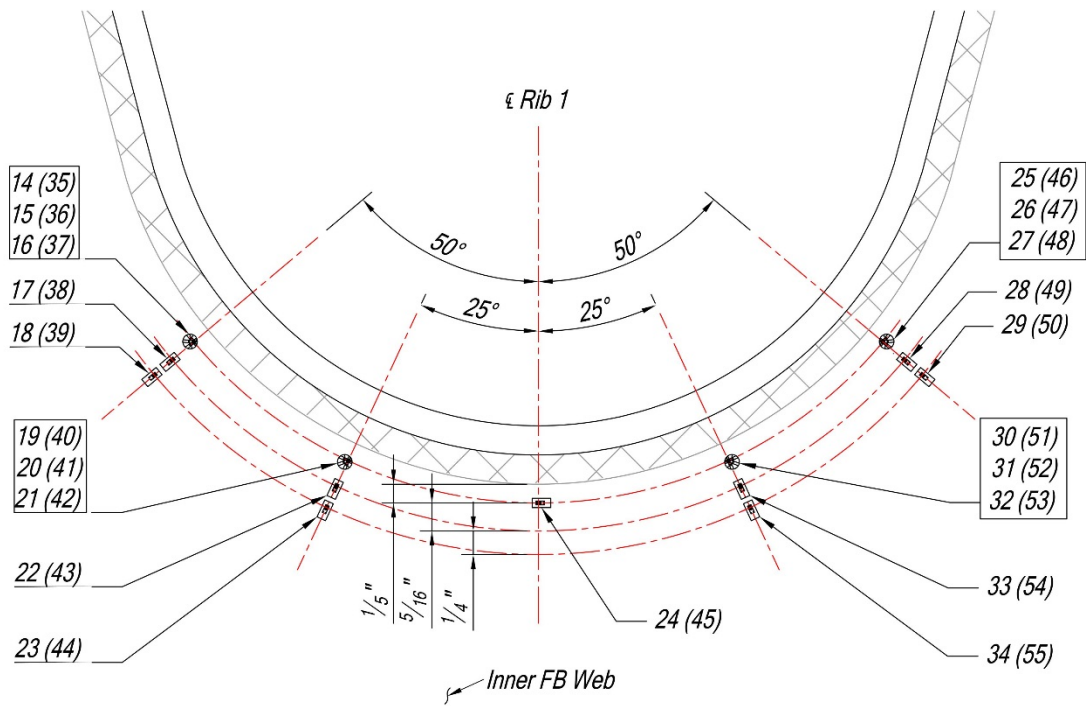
Gauges on east face of inner floor beam web at Rib 1 (gauges on the west face are shown in parenthesis)
